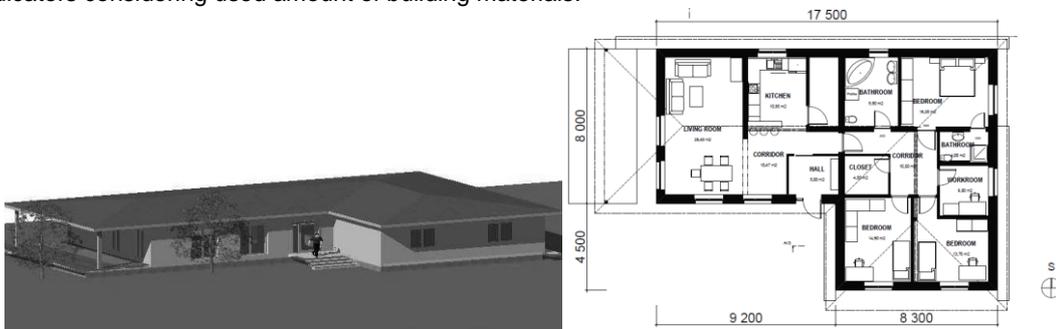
Perspective of bungalow and its scheme of ground-floor plan
